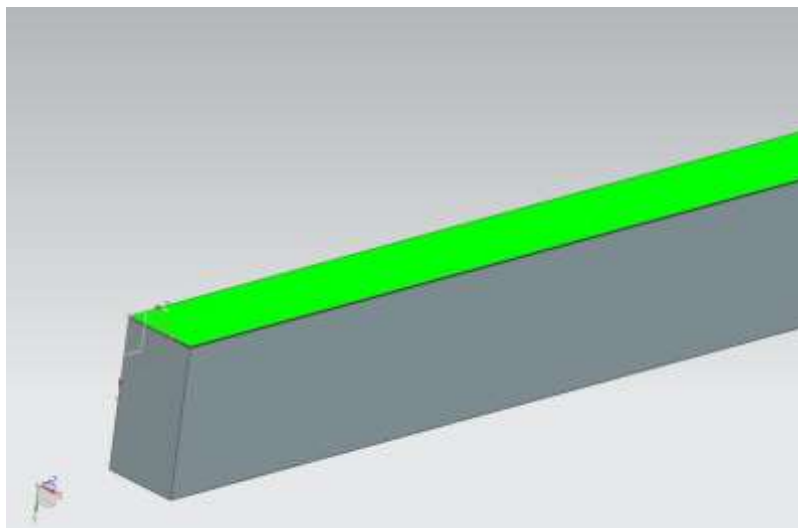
Warping Pattern of FRP laminates on the Beam section 14m
